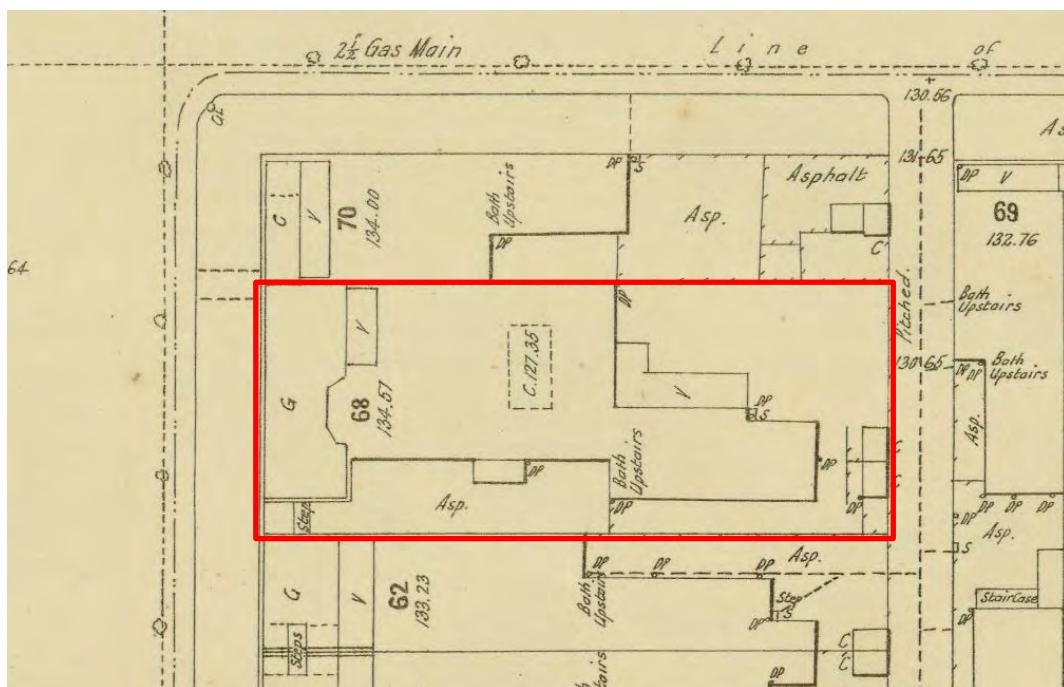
MMBW detail plan no. 1181, 1896, with subject property indicated
